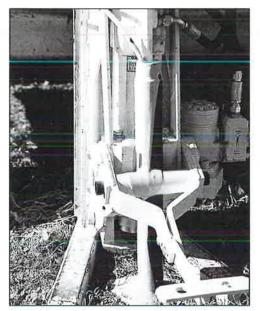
A grout machine and flexible tubing allow bottom-up grouting as the outer casing is retrieved.
